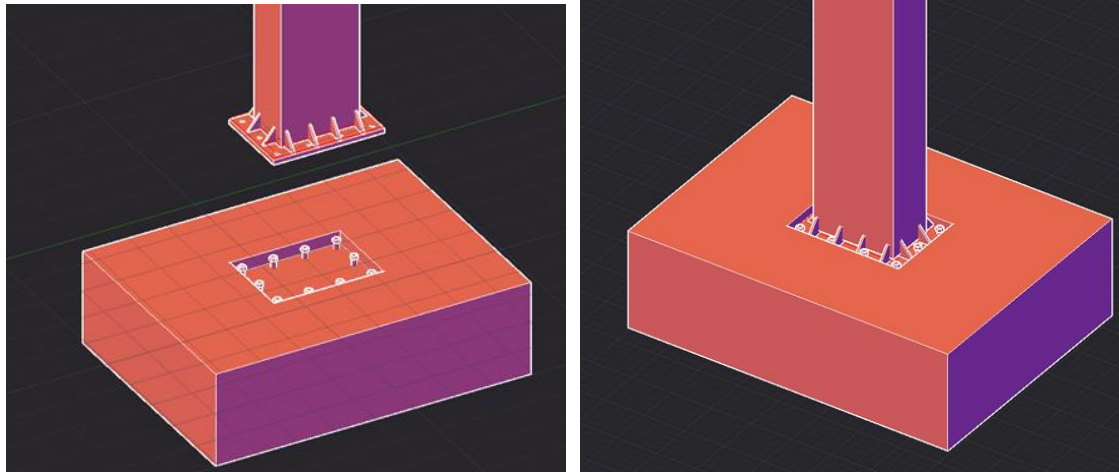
Modelling of demountable column-4 (a) During placing, (b) After Placing
